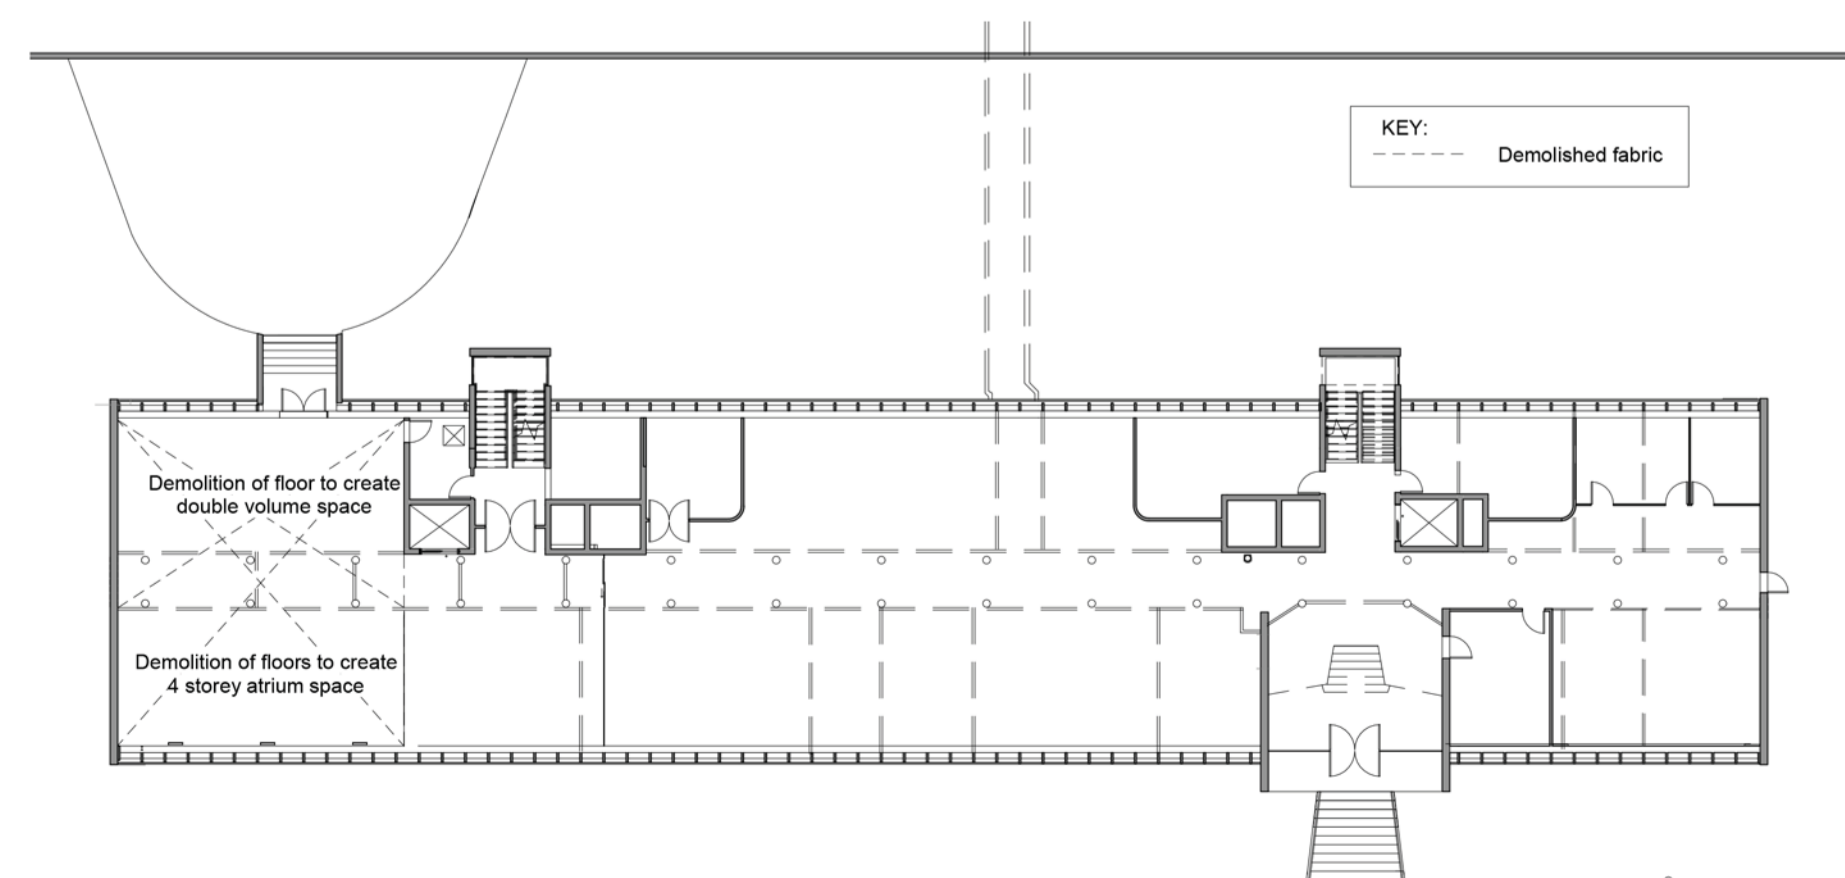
UPPER GROUND FLOOR DEMOLITION DIAGRAM
